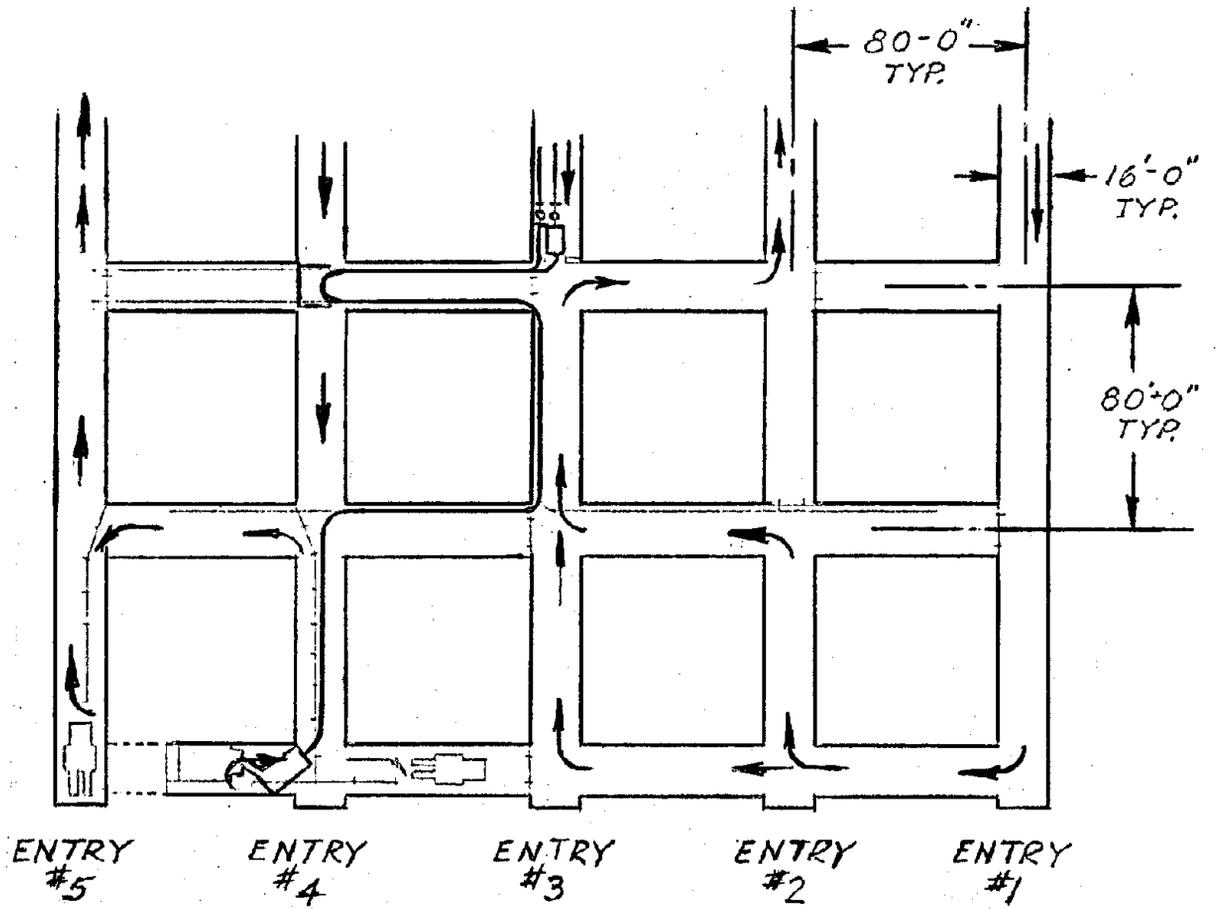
Mine Plan; Last Cut in Entry No. 4
